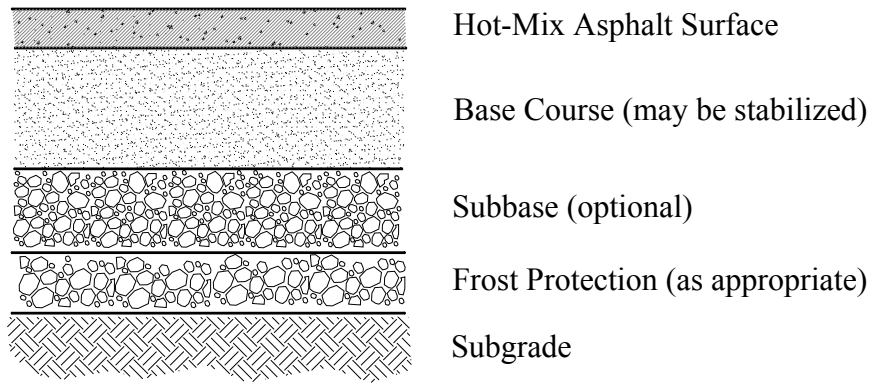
TYPICAL FLEXIBLE PAVEMENT STRUCTURE.
